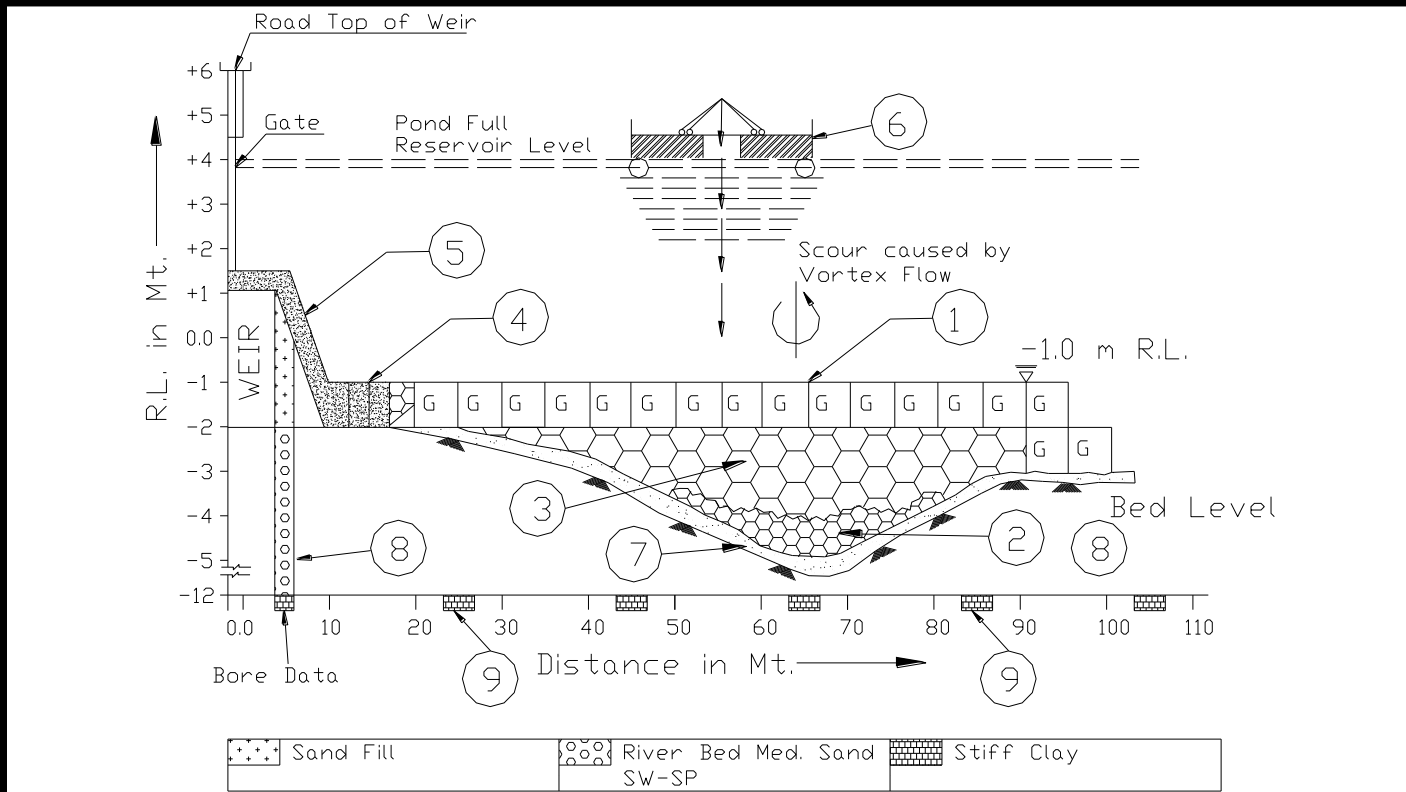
Typical Cross-Section of Upstream Scour Hole Indicating,(A)
